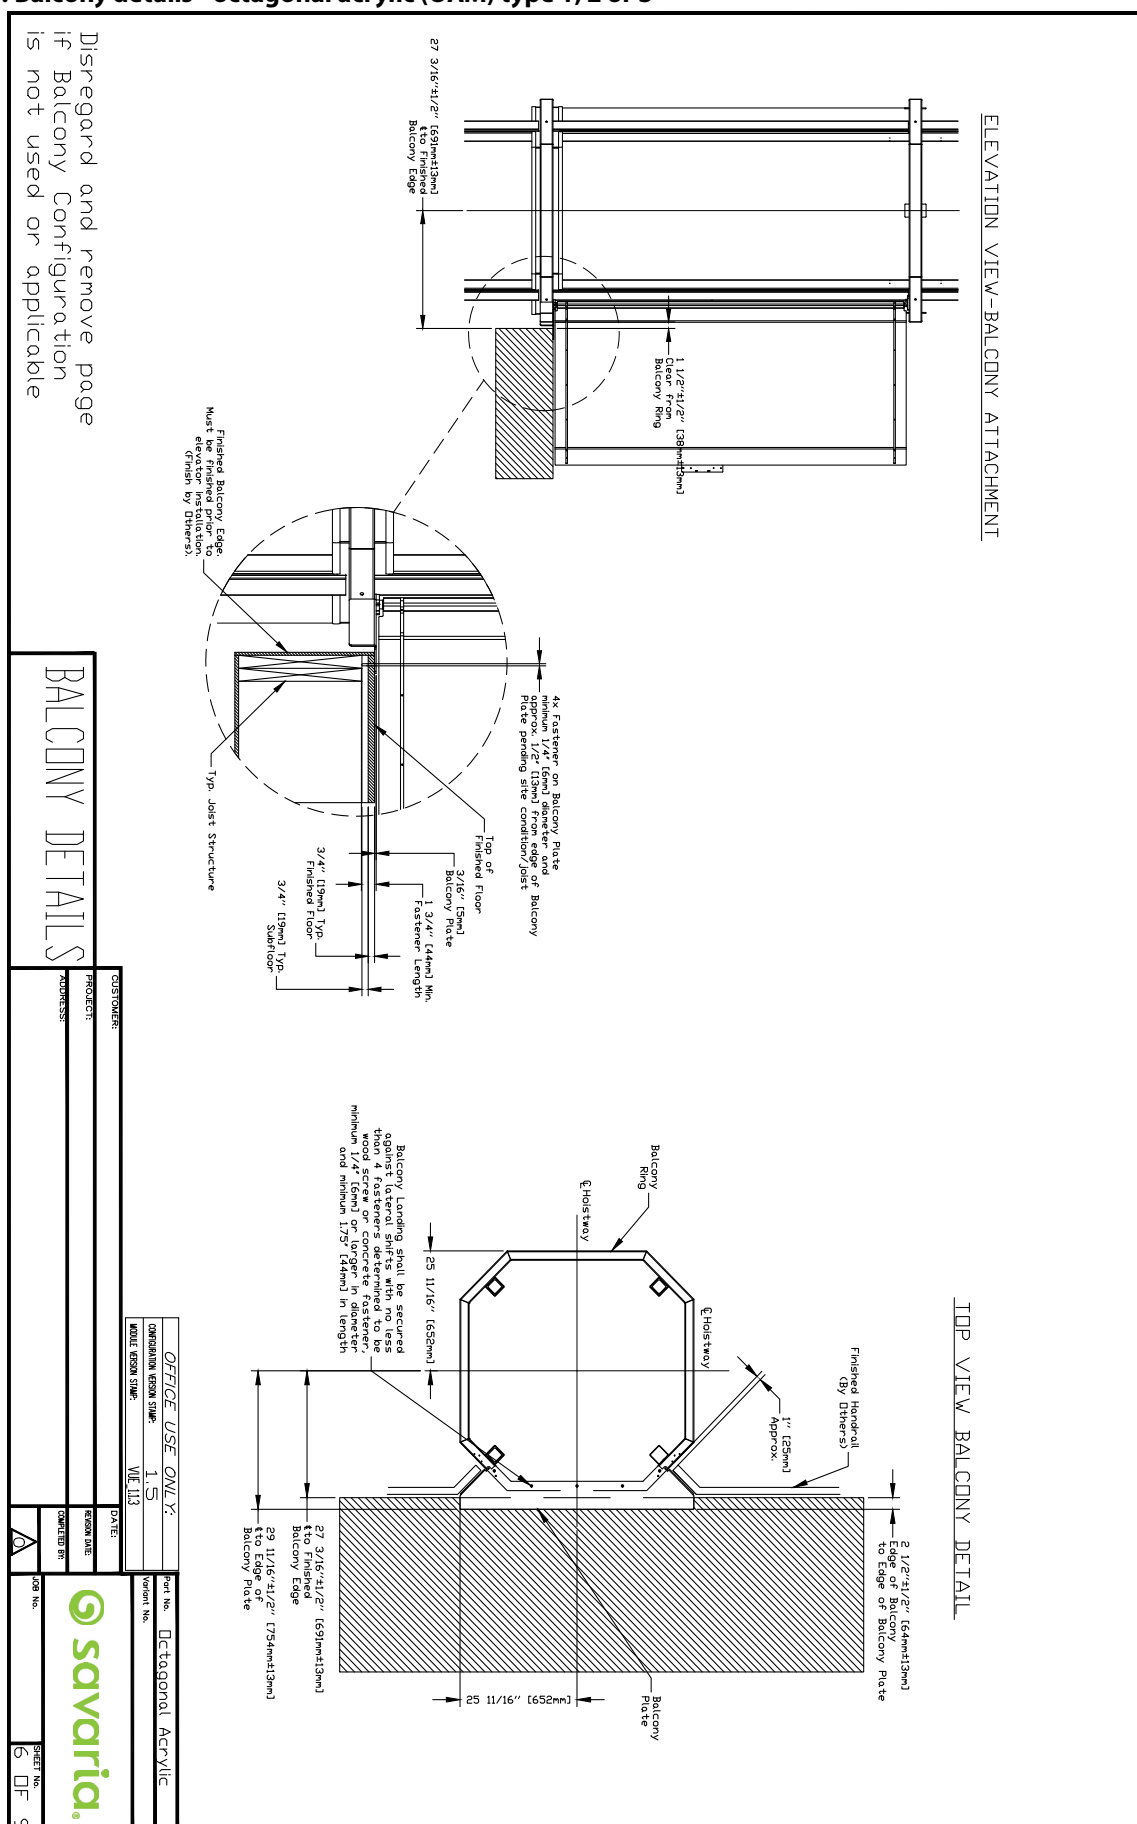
Elevation view - octagonal acrylic (OAM) type 1, 2 or 3
